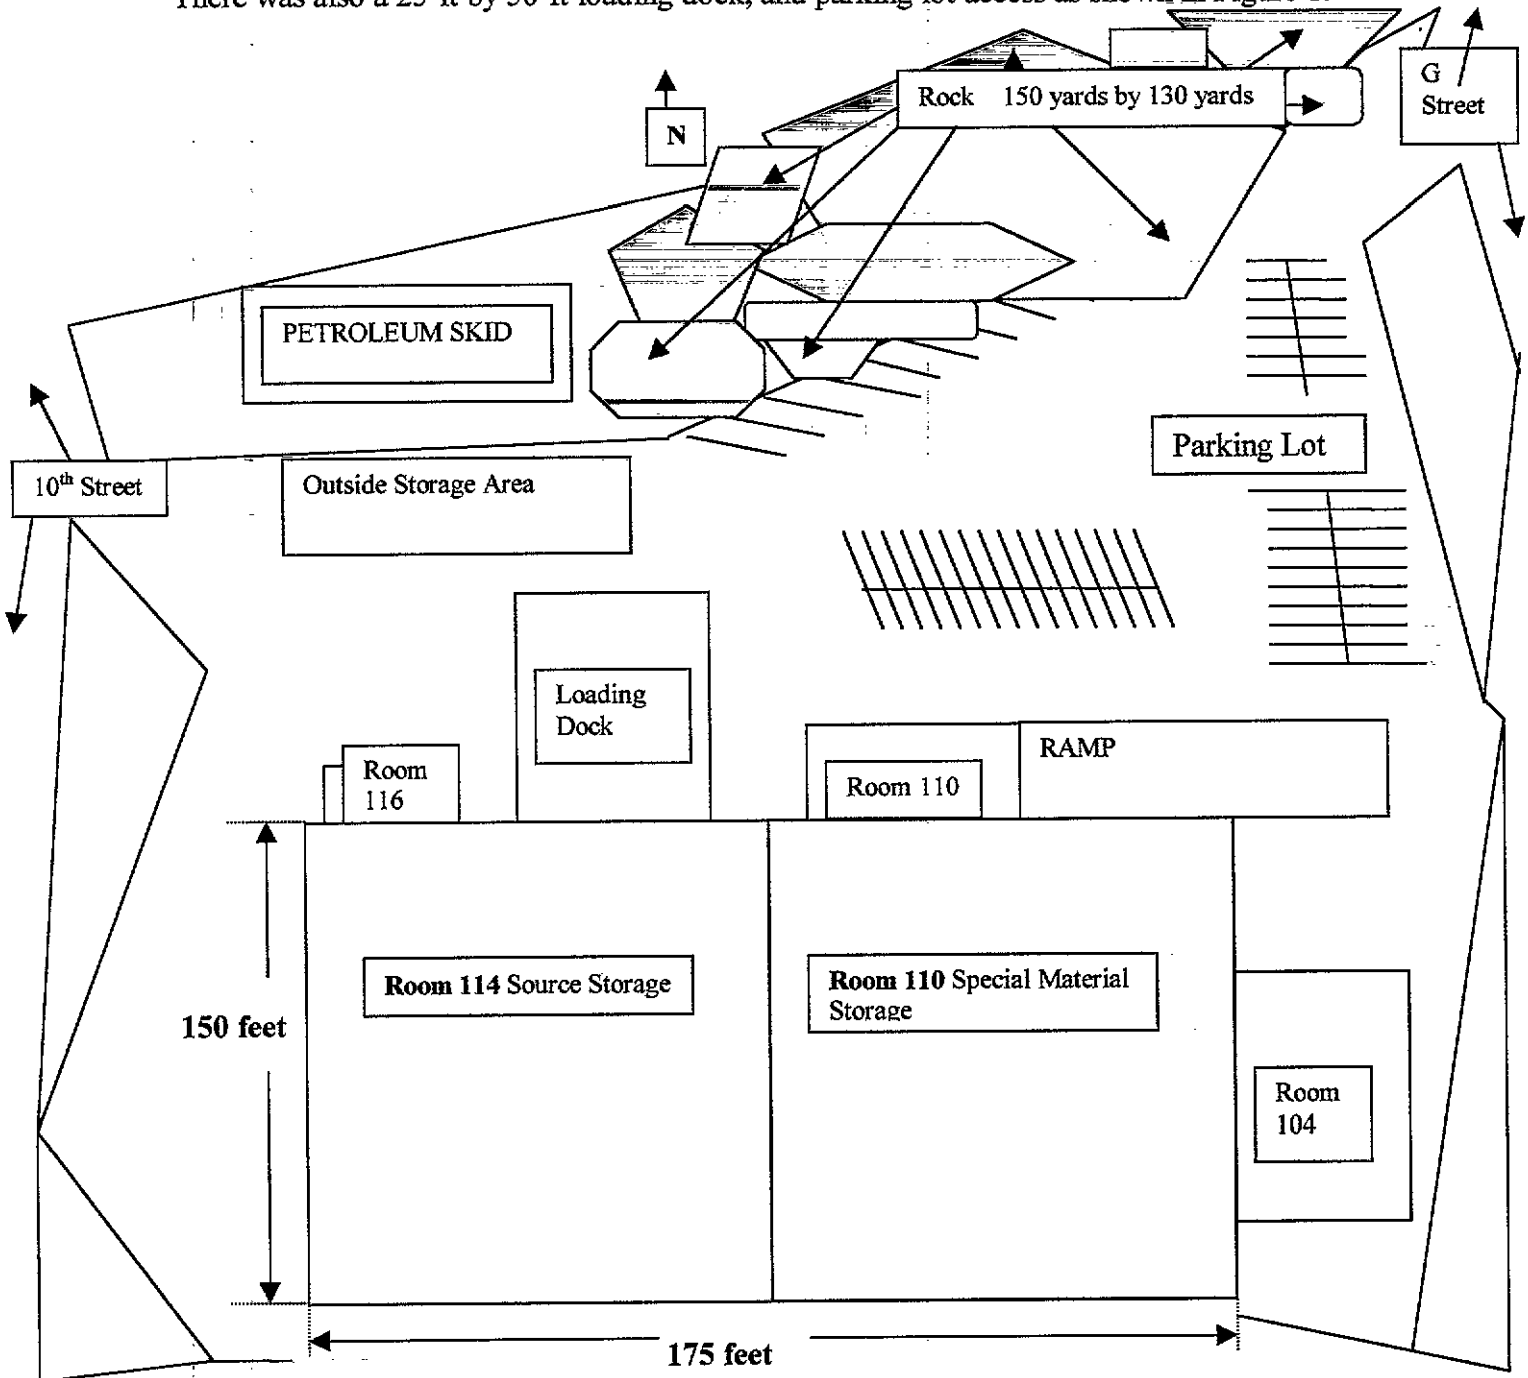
LAYOUT OF PRE-EXISTING BUILDING 4064
